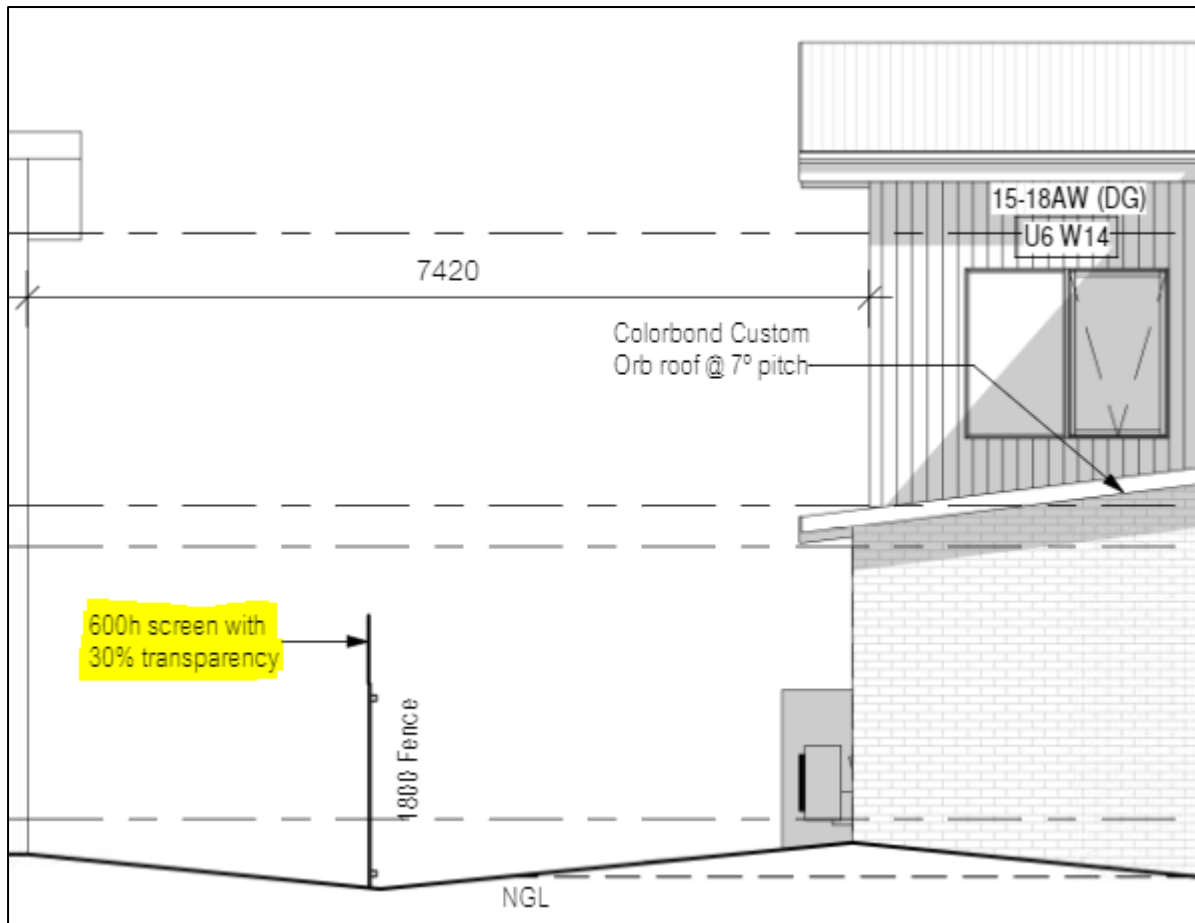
Section of east elevation plan for Units 5 and 6 highlighting the proposed fence screening addition
